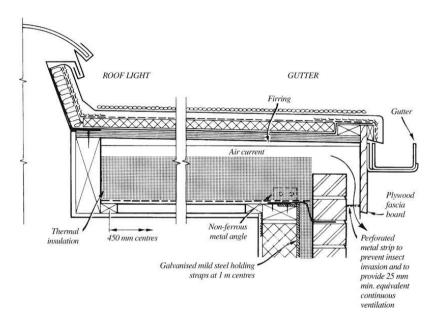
Typical flat roof construction. Details are for a cold roof construction where the thermal insulation and vapour control layer are held against the underside of structural timber joists by battens placed at right angles. In order to minimise the perforations in the vapour control layer, electrical lighting conduits are not installed in the structural zone of the roof. Note: A metal-foil-backed plasterboard nailed direct to the underside of timber joists is a simpler alternative to battening.
